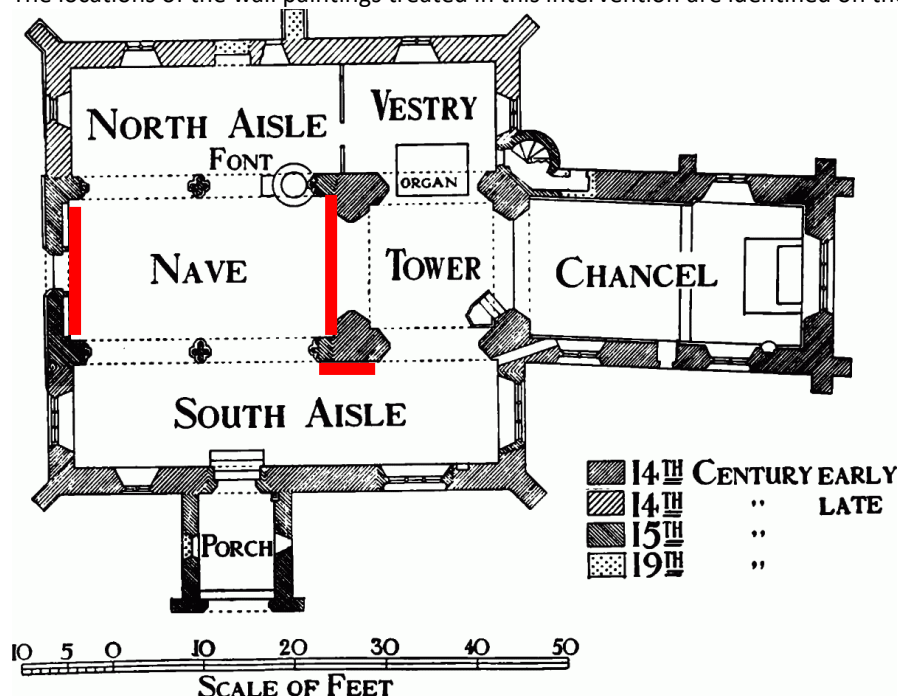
Church plan with wall painting locations in red. (Extracted from <http://www.british-history.ac.uk/vch/oxon/vol5/pp56-76>)
